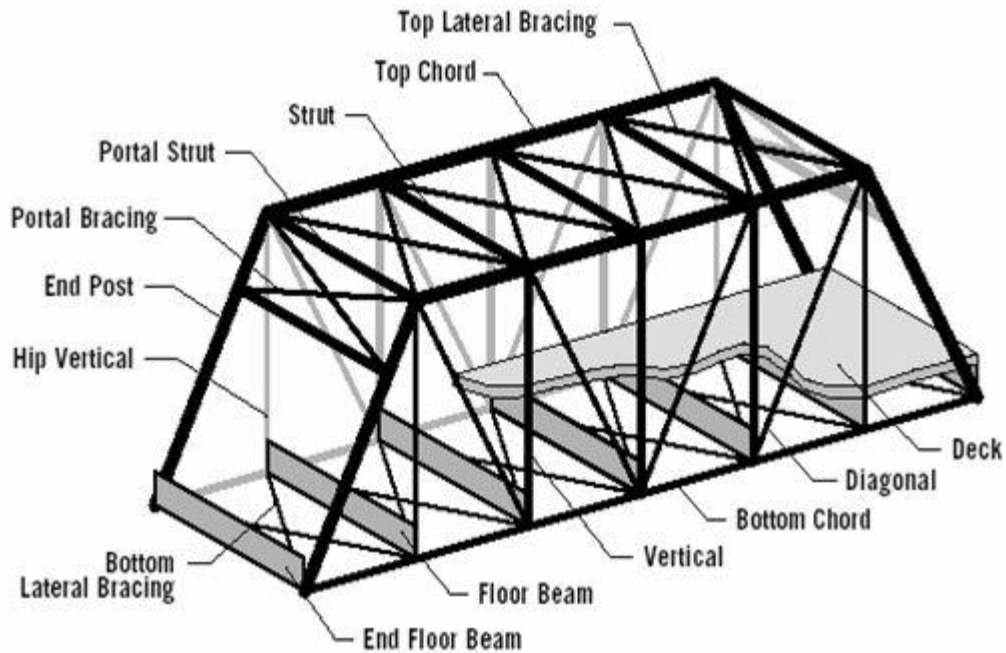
Isometric view of a basic truss bridge plan. This image features the major structural components of a truss bridge, all of which are labeled. Note the repeated triangles formed by the members of either truss. (Figure from Ressler, 2001, p. 3.)
